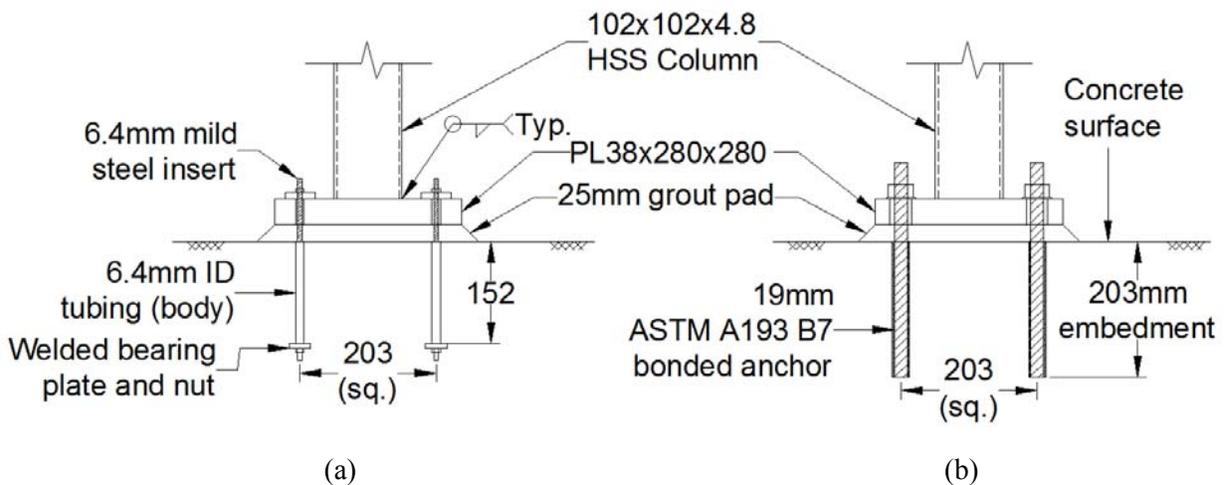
Details of the base connections utilized in the structure: (a) base connection dominated [BD] test structure and (b) structure dominated [SD] test structure.
